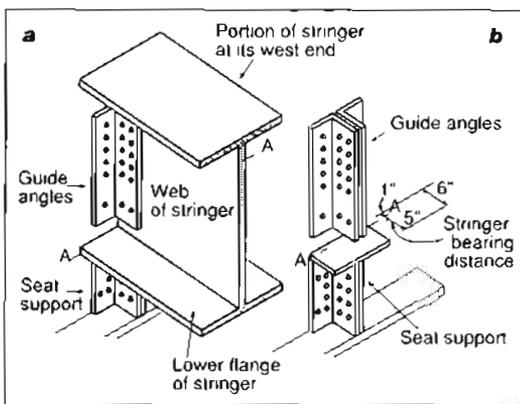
Support conditions at west end of deck stringer: view A shows stringer in position, view B shows stringer removed.
